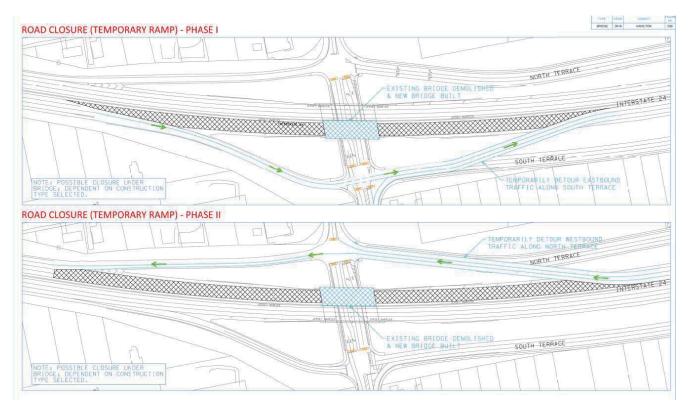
Traffic Control Plan for the I-24 Bridge over Germantown Road Road Closure (Temporary Ramp)
